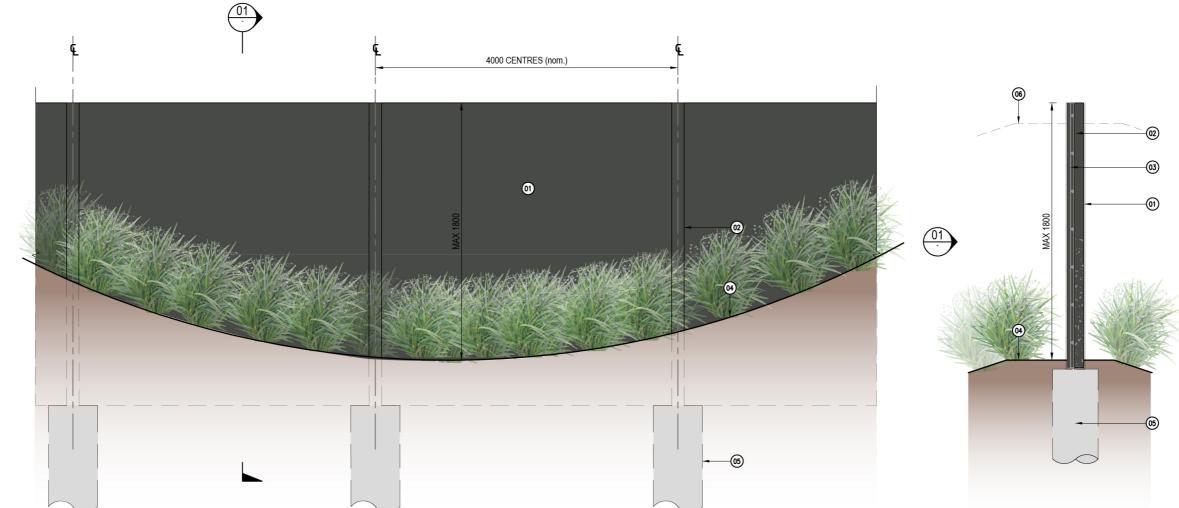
Noise Walls - Typical Details - Mound Cross Section
